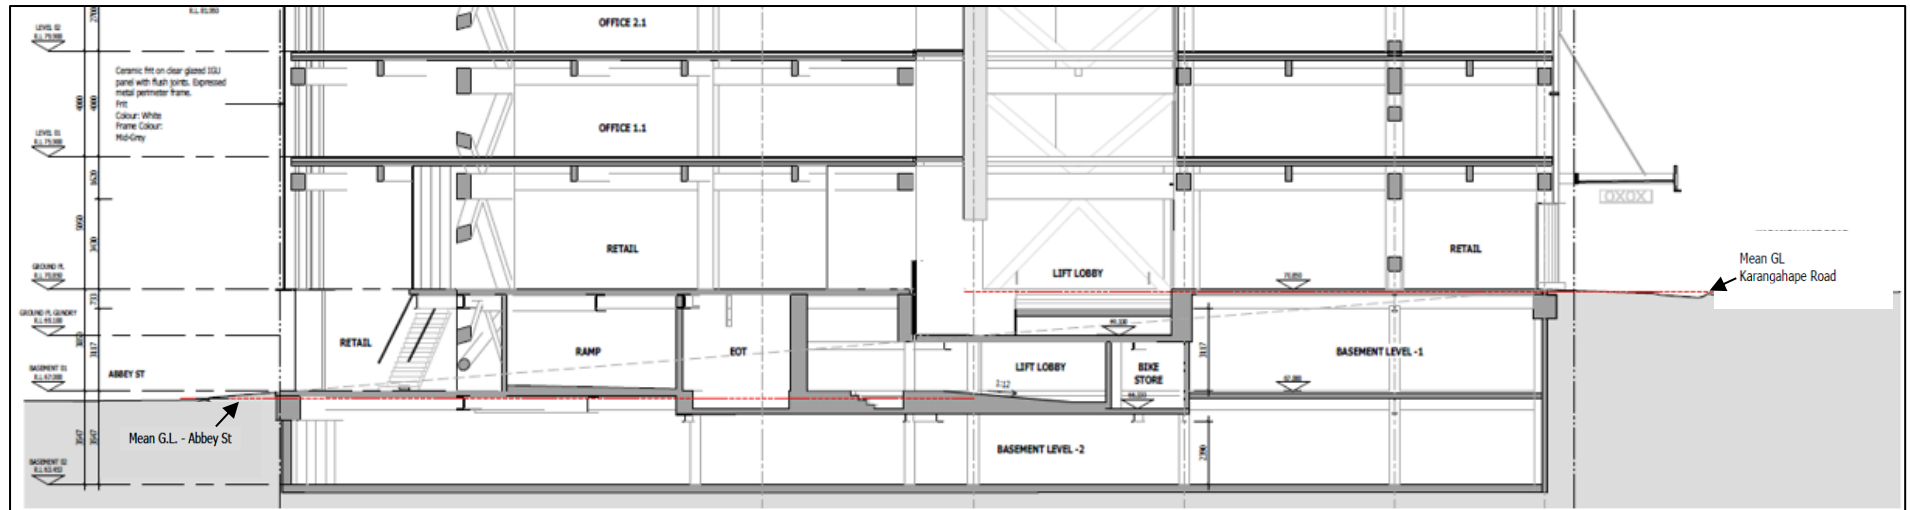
Section drawing showing the basement and lower levels of the proposed new commercial building with mean ground level indicated by red dashed lines (source: Fearon Hay)
